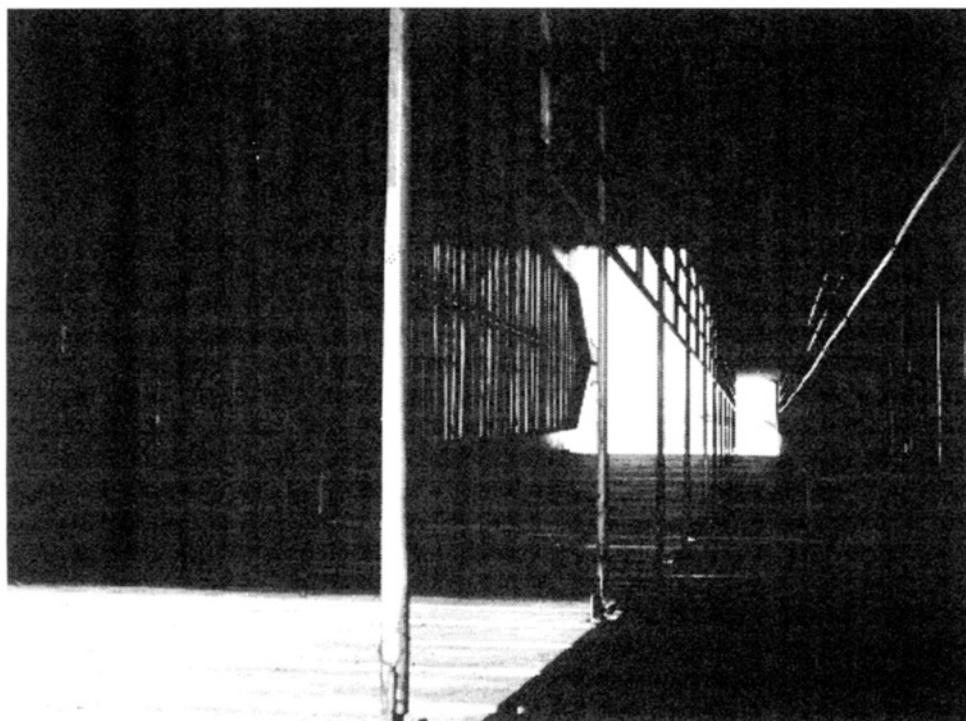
Narrow bike bridge inside a culvert as a cheap way to construct a crossing.
